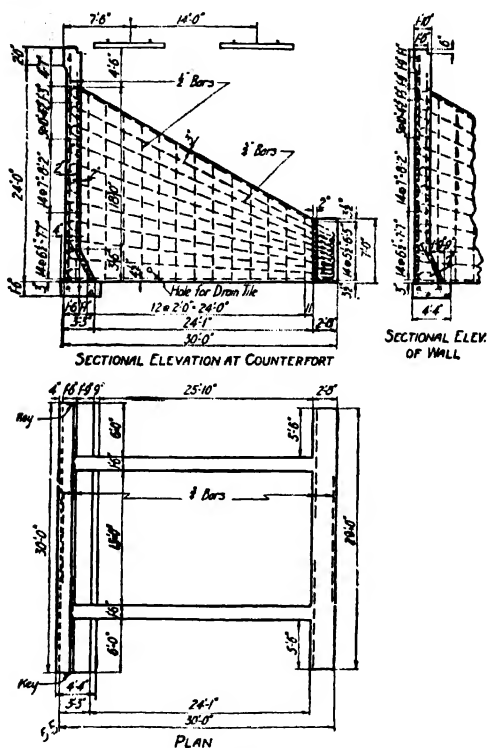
Cellular retaining wall of C. M. & St. P. Ry.
